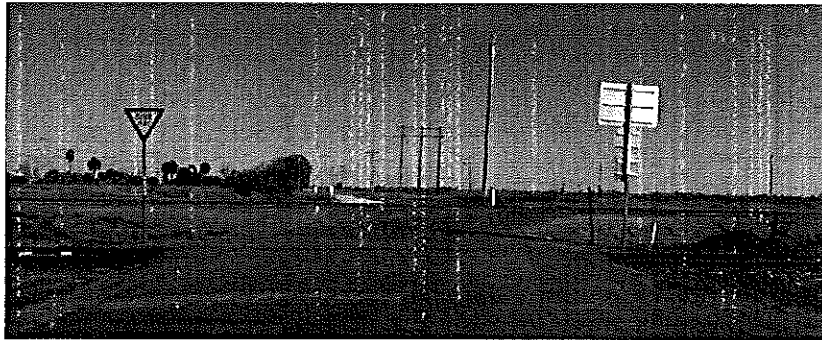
Hamilton Road. Photo taken from Hamilton Road looking south-west.
